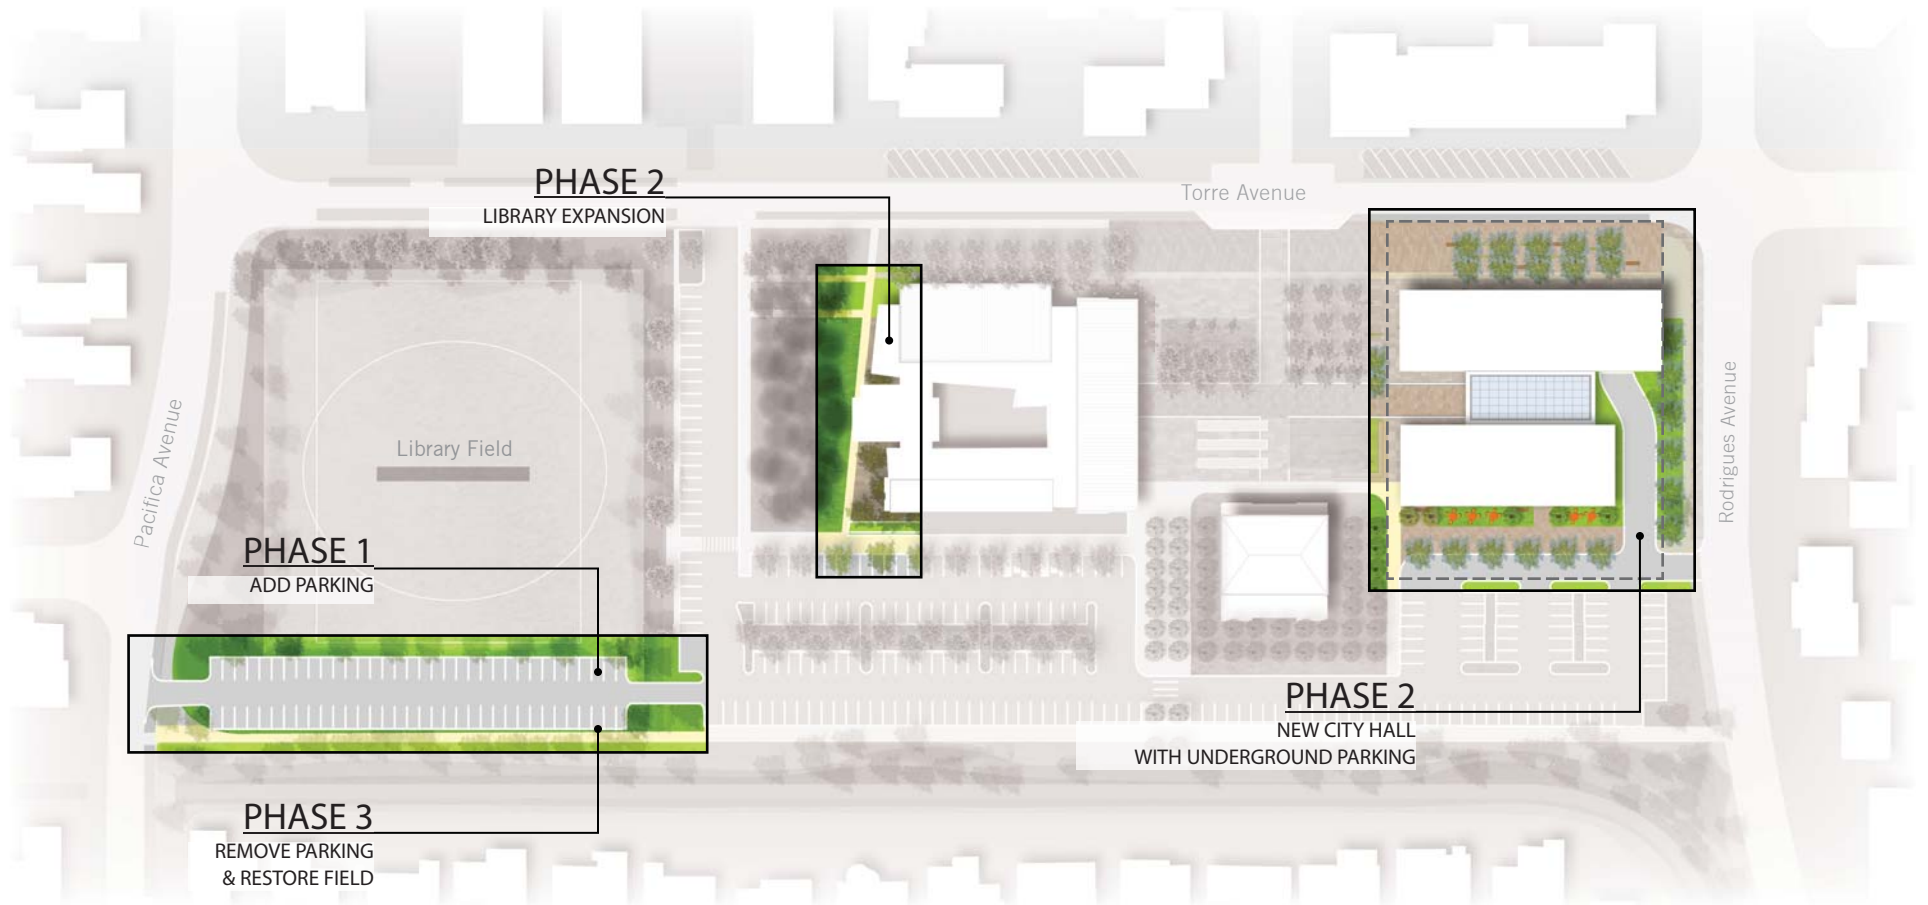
Potential phasing plan for the Civic Center Master Plan
